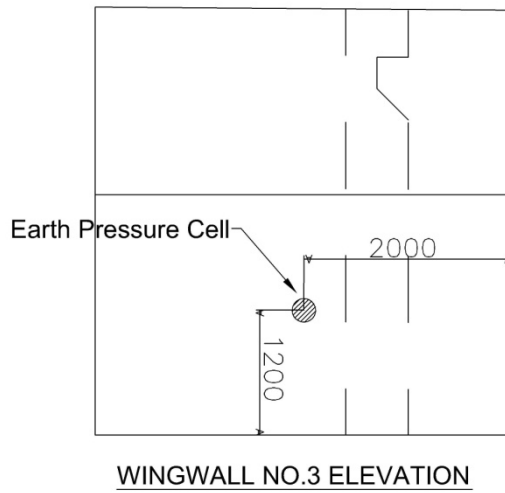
Wingwall Earth Pressure Cell at Middlesex Bridge
